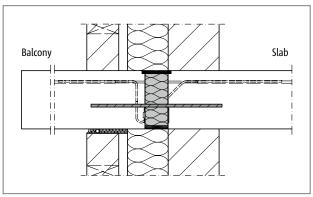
Schöck Isokorb® T type H-NN: With T type K-E, K-T; connection for core insulation
